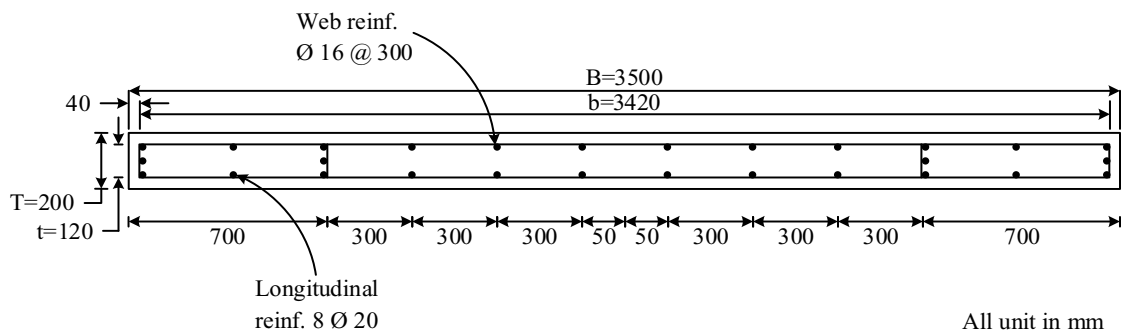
Reinforcement details and cross-section for walls 1 and 2 (Masjuki, 2017)
